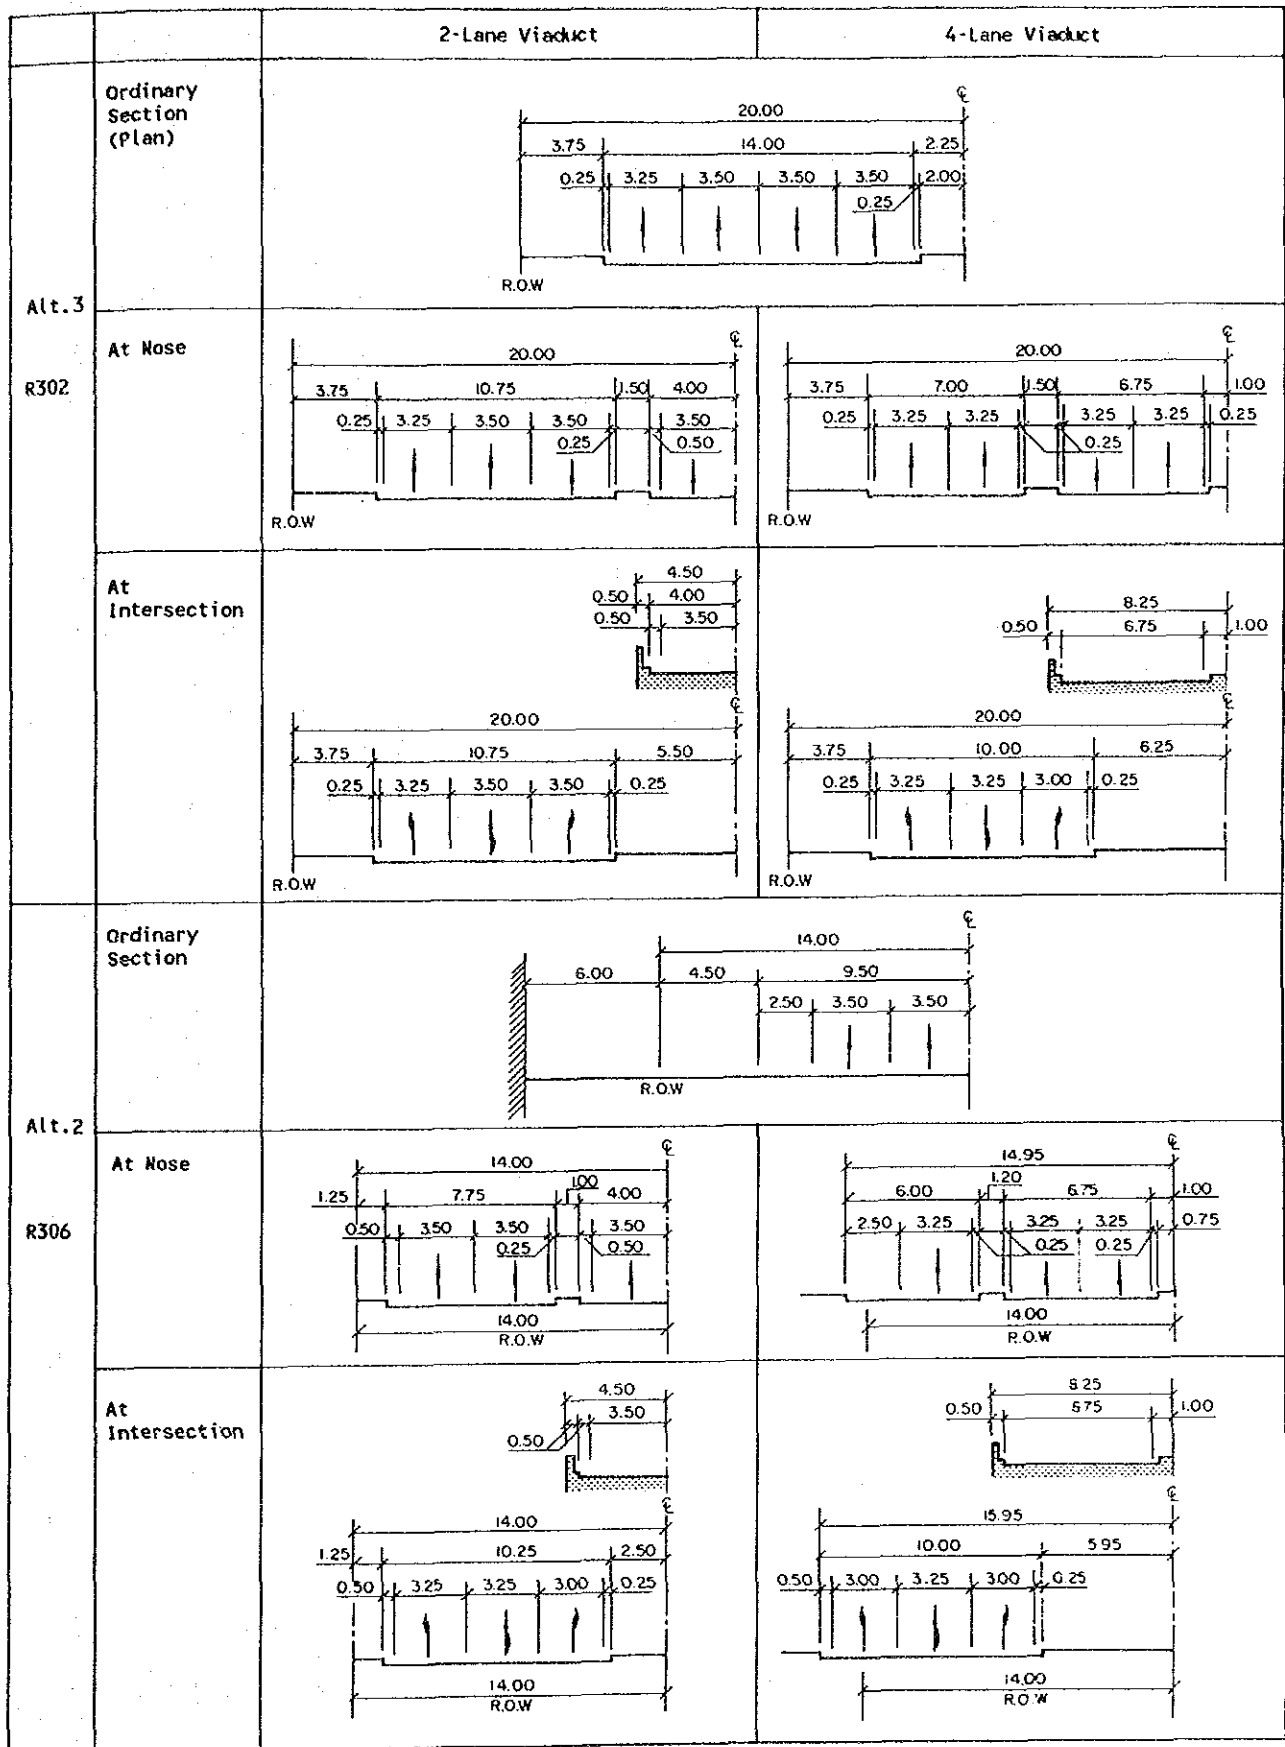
CROSS SECTION ELEMENT OF ALTERNATIVE PLAN
